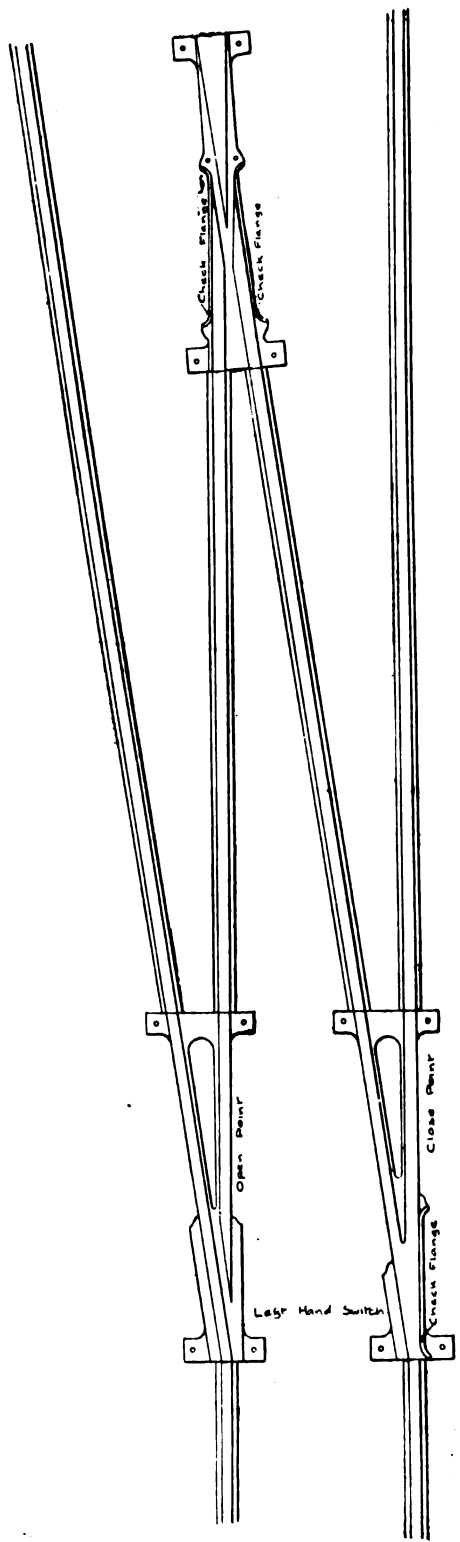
CAST STEEL POINTS AND CROSSINGS.—LEFT-HAND TURN-OUT.
